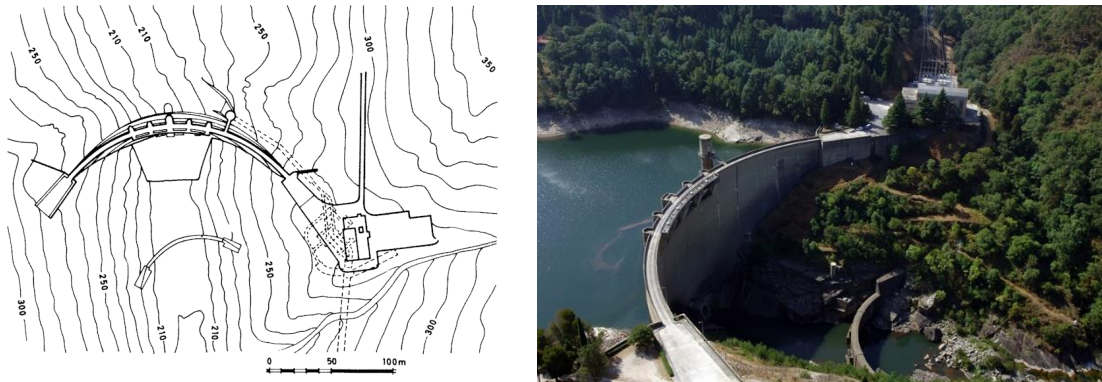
Salamonde dam: plan view (CNPGB); dam's picture (EDP).
